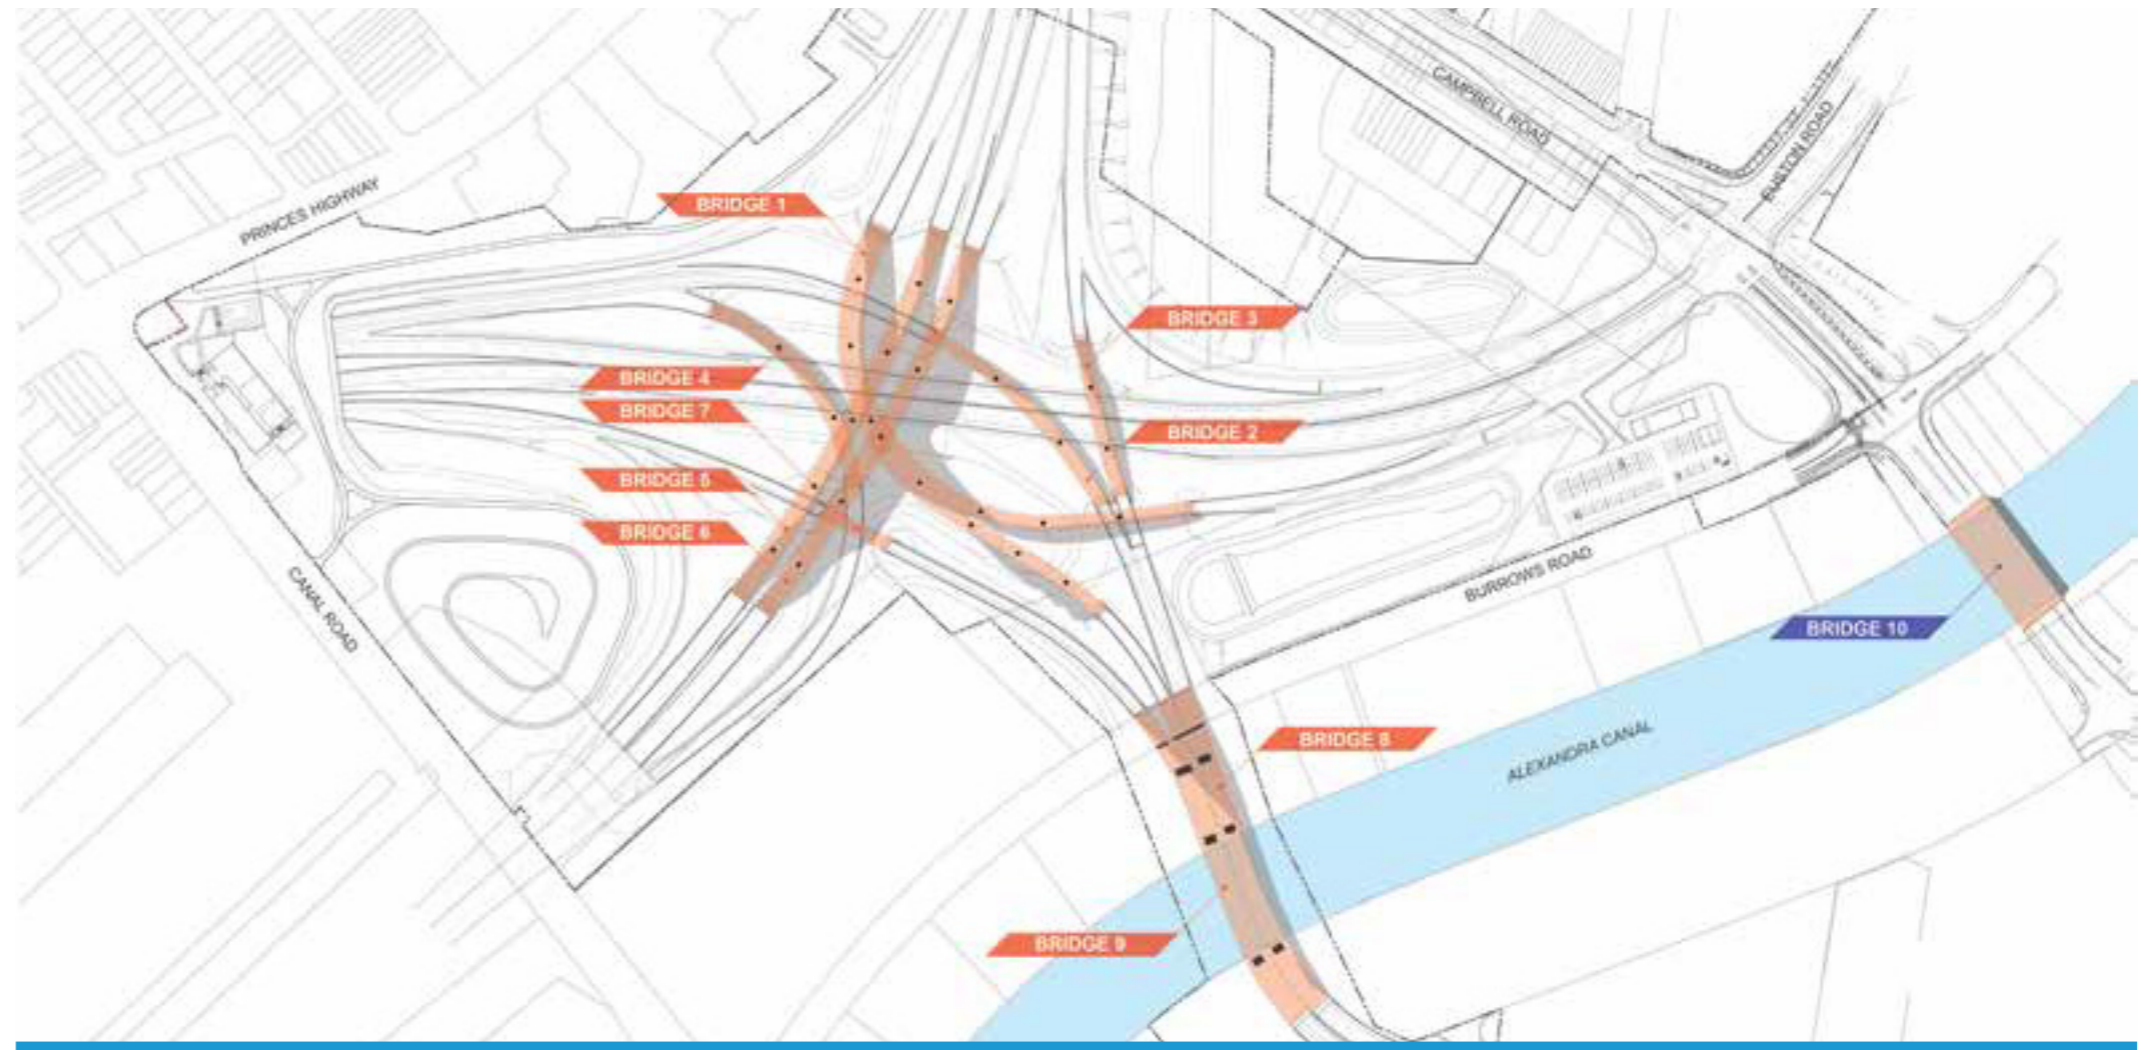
Site plan showing Bridges 8, 9 and 10 (Source: Urban and Landscape Plan, p. 257)
